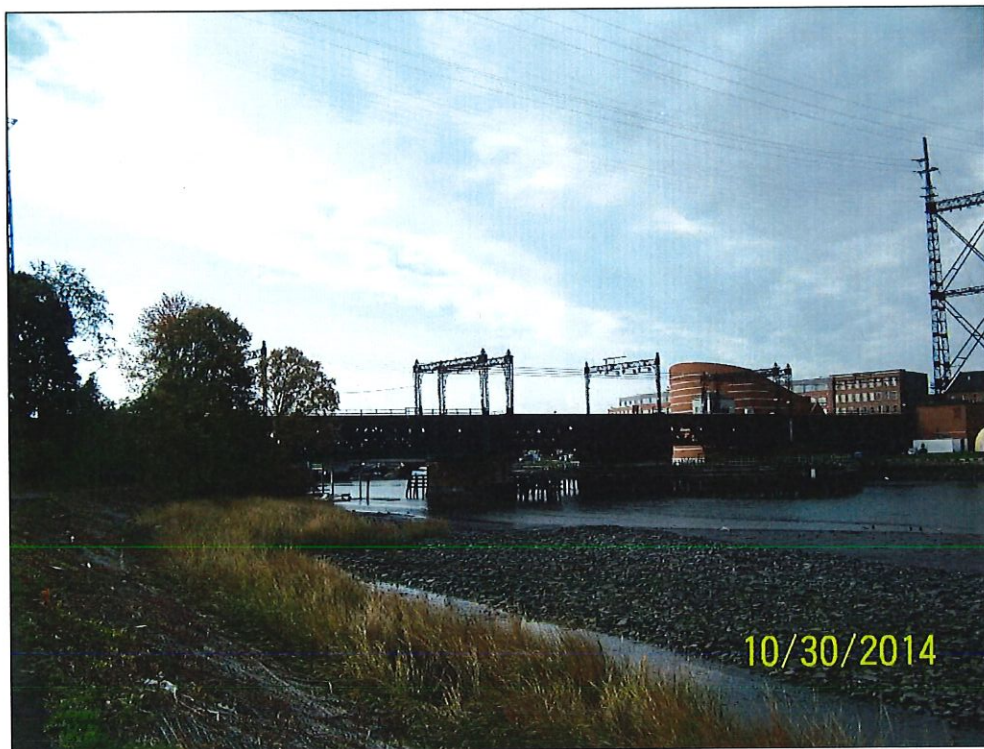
View of the upstream side of Walk Bridge looking southwest.
